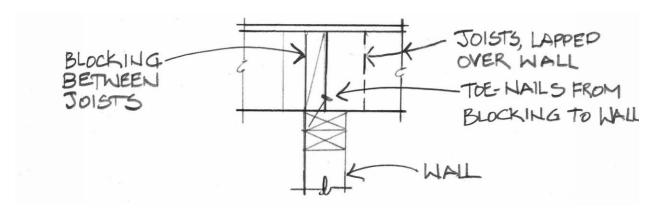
Toe-nails fastening the second-floor blocking to the Line 3 first-story wall.
